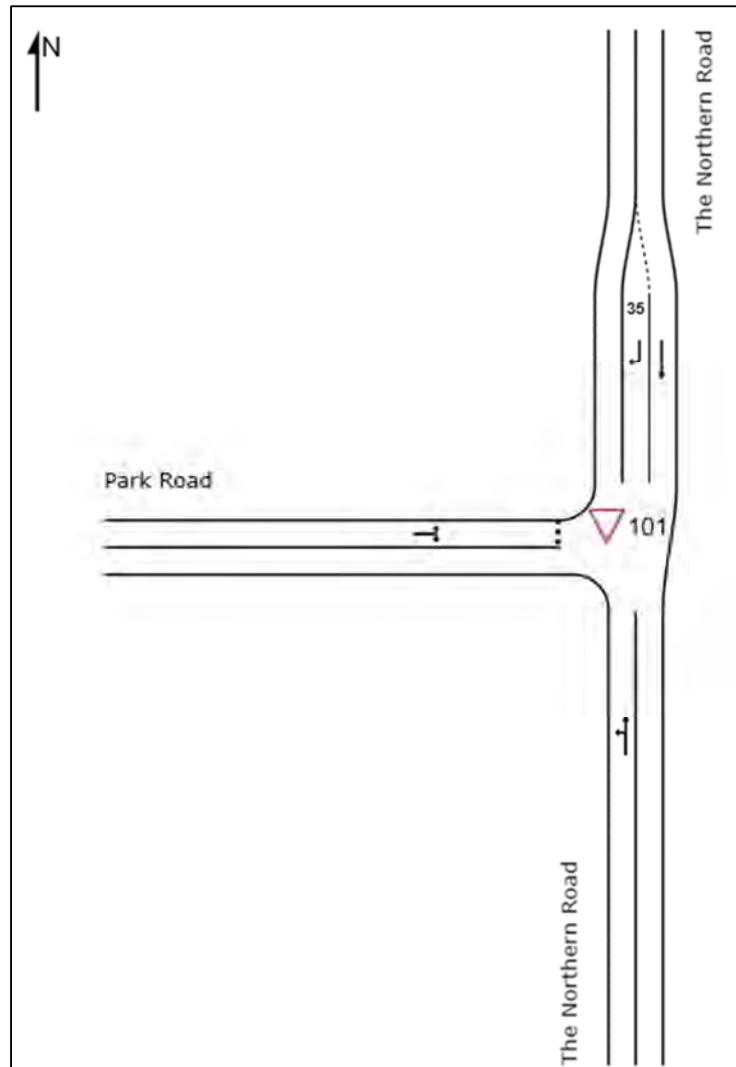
Stop Intersection of The Northern Road with Park Road (SIDRA)
